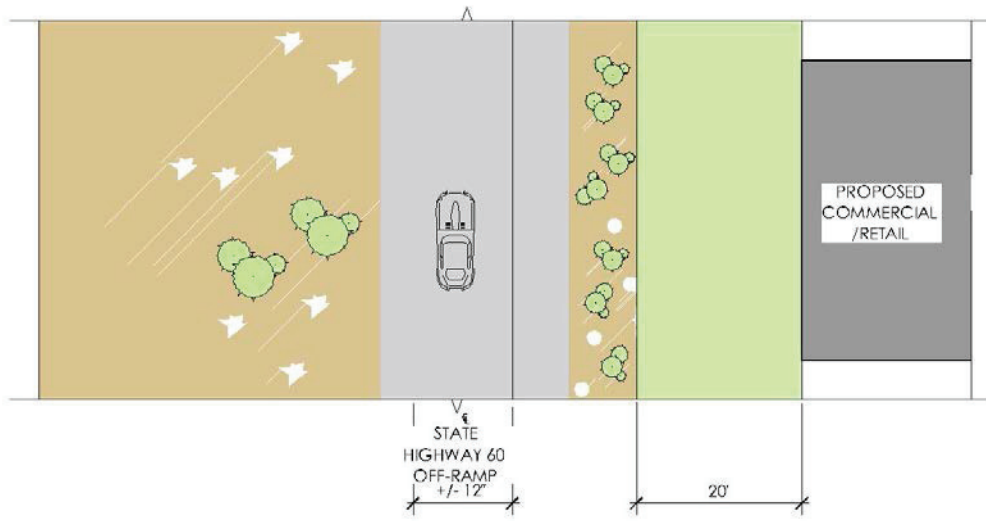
State Highway Off-ramp 60 Edge Plan J
